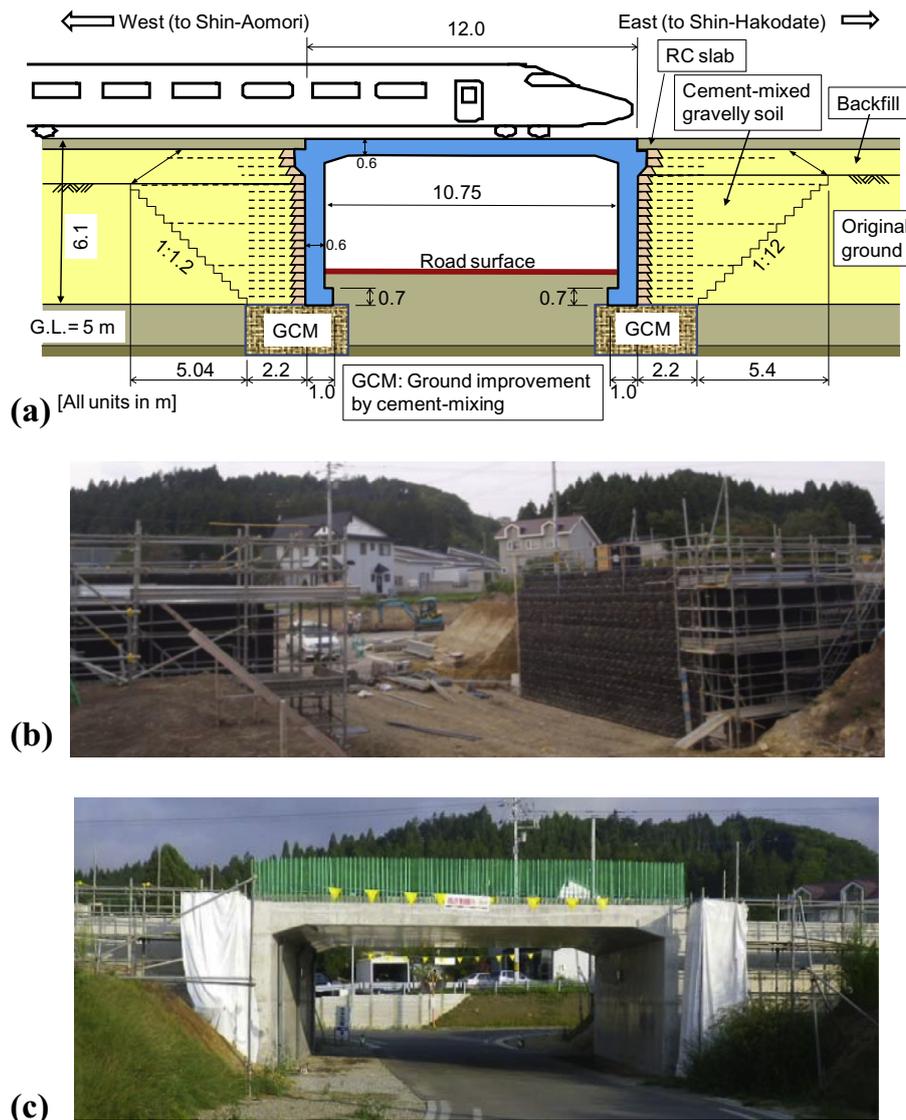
GRS Integral Bridge at Kikonai (at site I in Fig. 2): (a) structural details; (b) during construction (14 Oct. 2011); and (c) completed (31 July 2012).
